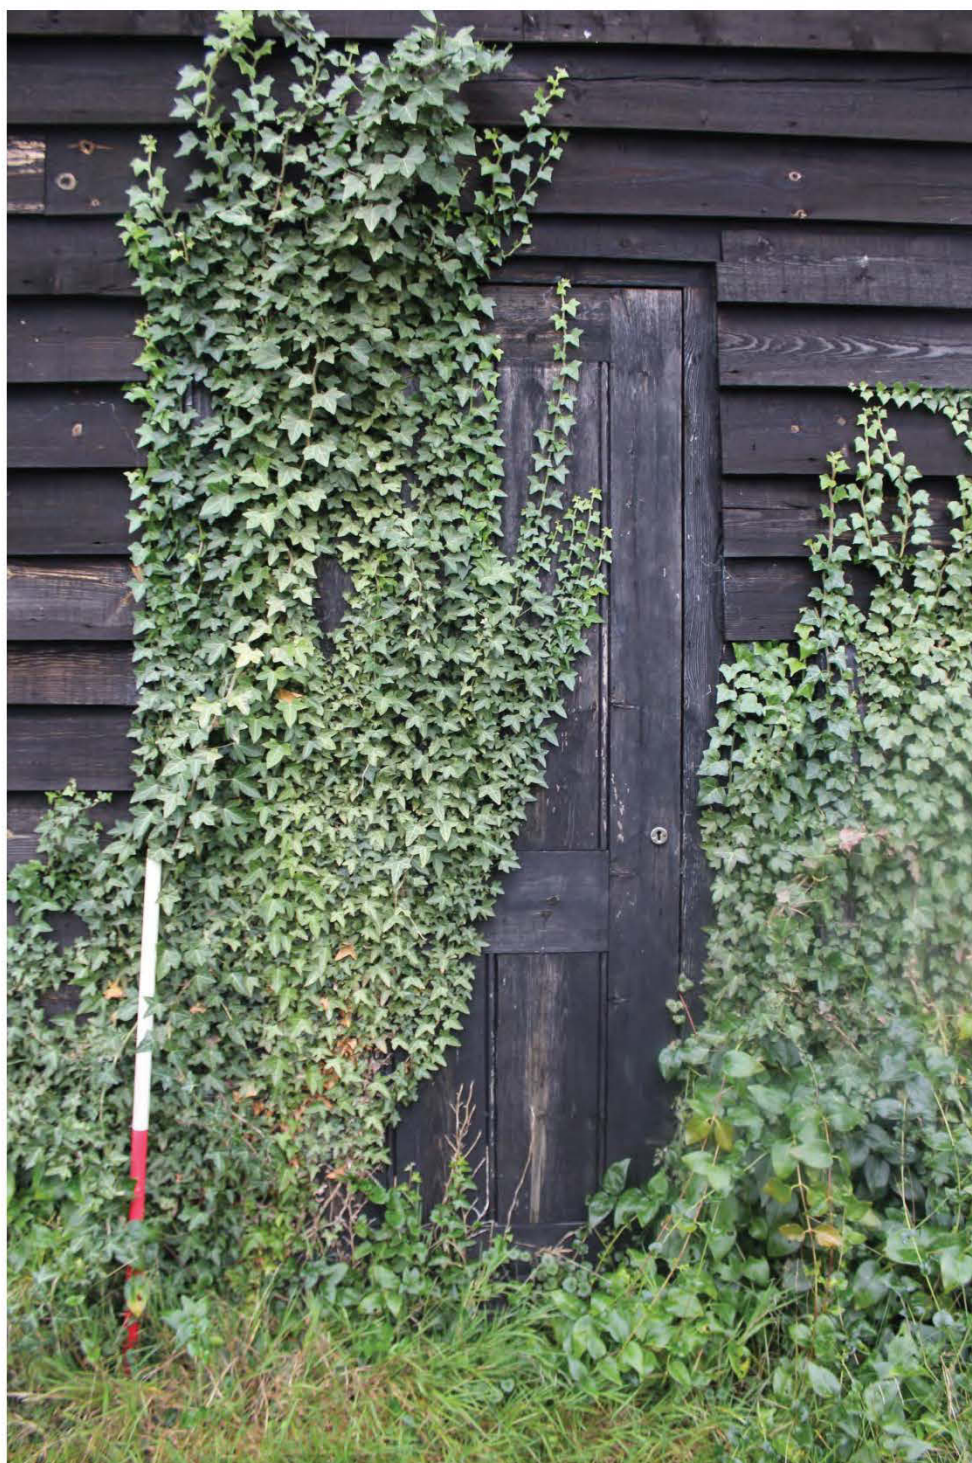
Access door inserted into location of former opening on the north-east facing elevation
